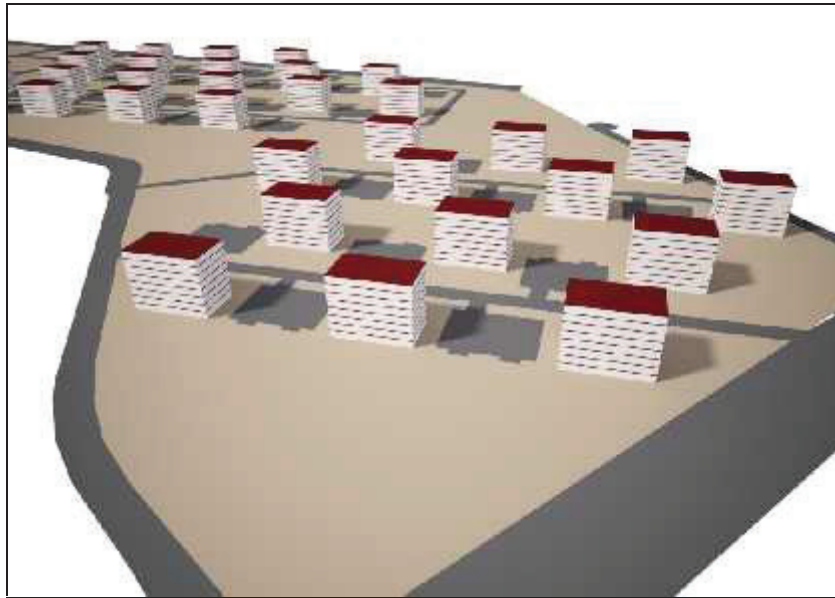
Site model of eight-storey buildings alternative (Mert, 2014)
